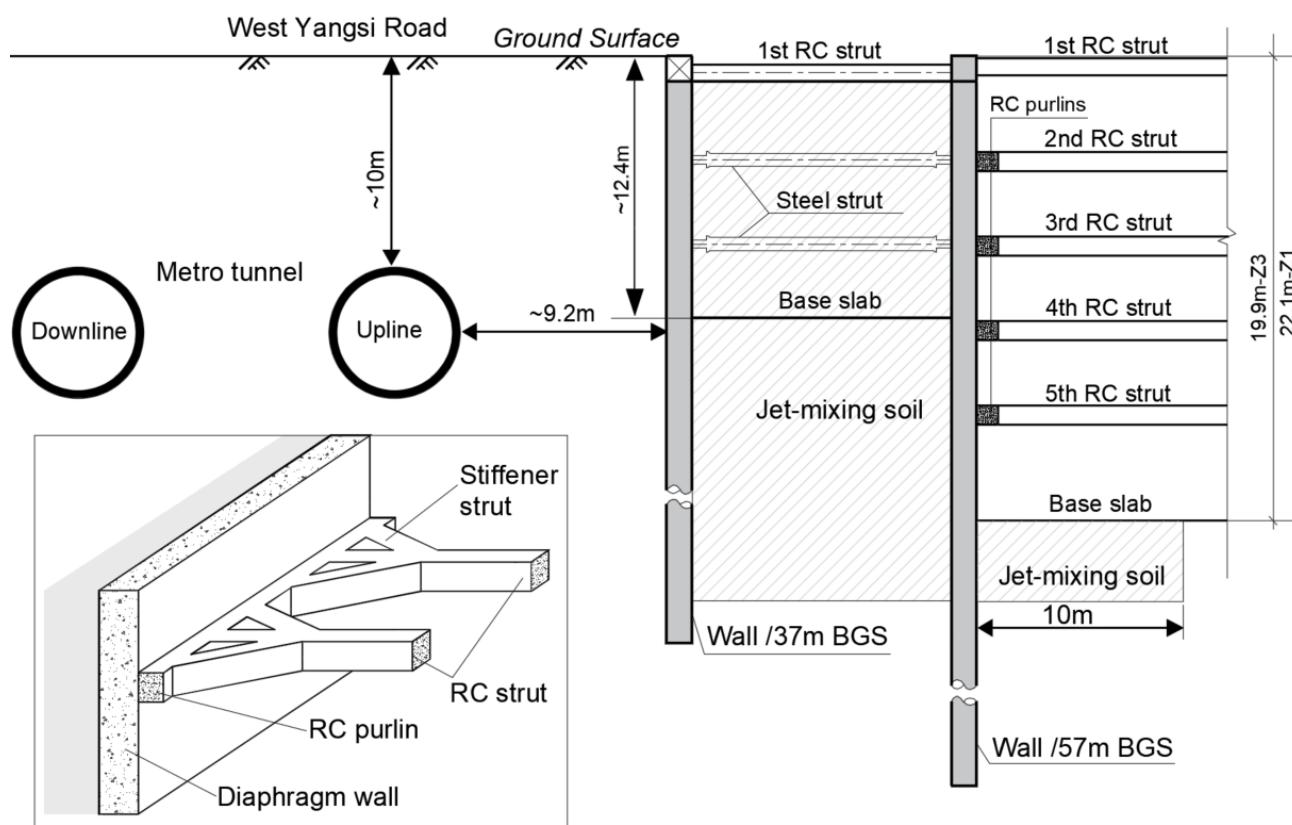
Bracing structure design of the foundation pits: (in lower left corner is strut–purlin–wall connection).
